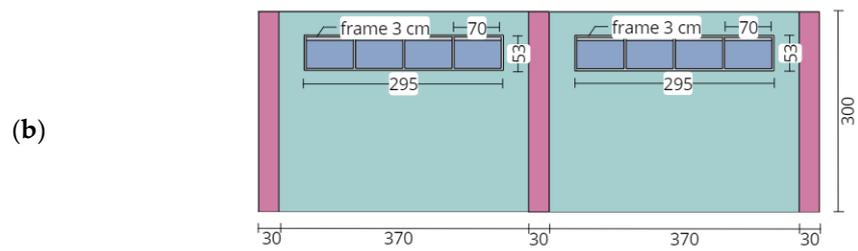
(a) Dimensions of north side openings of sample A by SketchUp; (b) Dimensions of south side openings of sample B by SketchUp.
